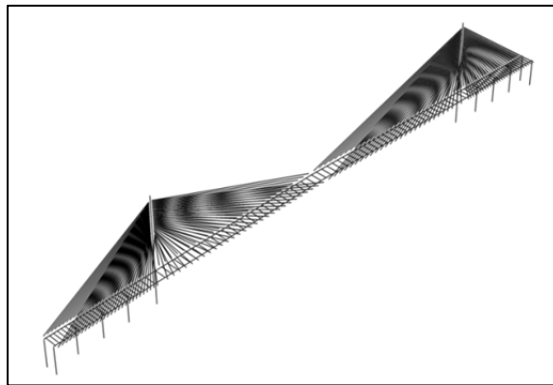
(a): ABAQUS model of Stonecutters Cable-stayed Bridge, general view.
